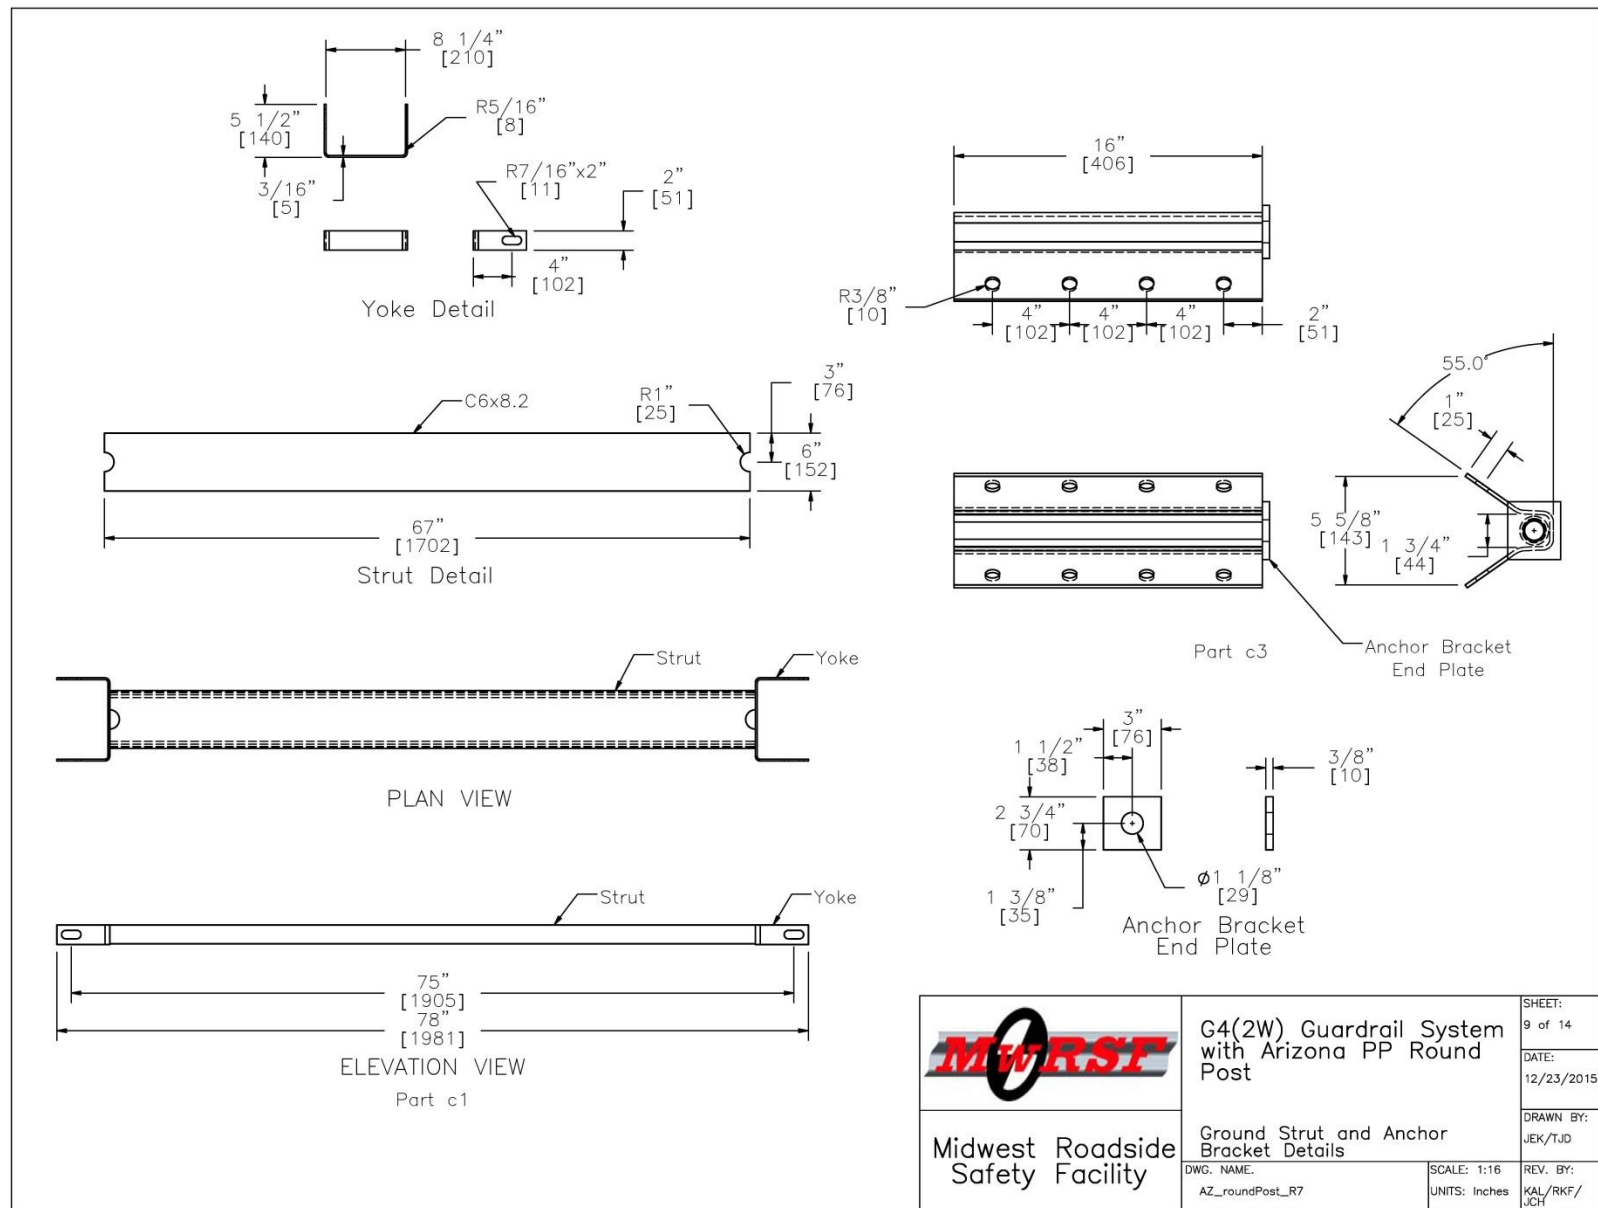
Ground Strut and Anchor Bracket Details, Test No. AZRP-1
